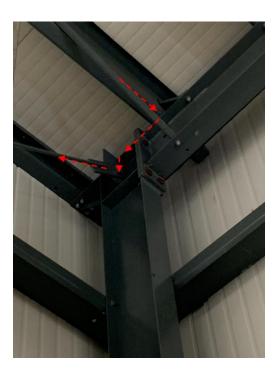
Indirect Load Path from Diaphragm to Brace Frame
